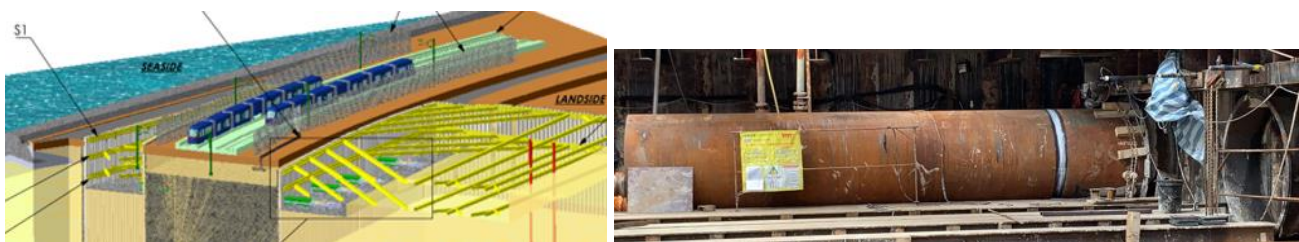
Installation of Canopy Tubes above Crown of Tunnel Boxes by micro TBM and pipe jacking
